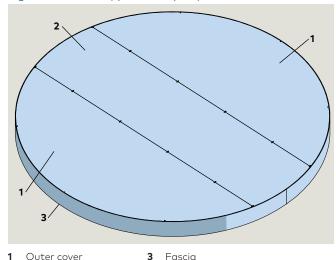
3 1/8"canopy assembly, bottom view
